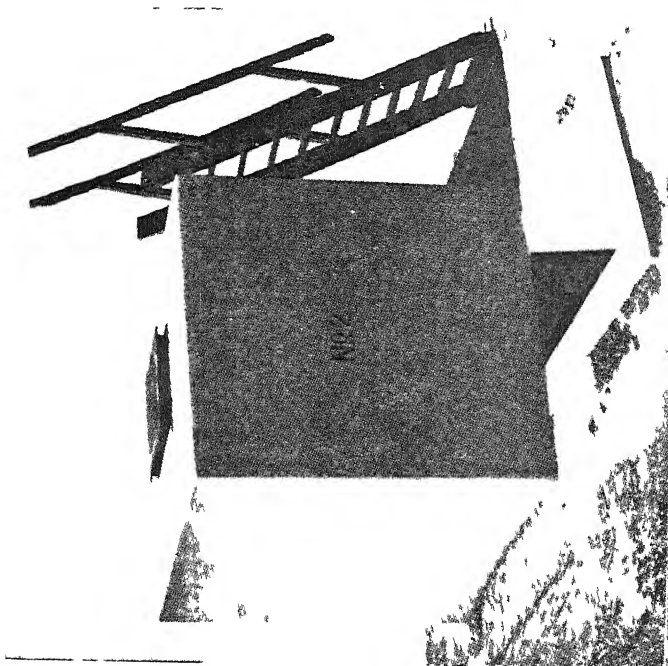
Reinforced concrete bin used at the Agricultural College, Lyallpur.
